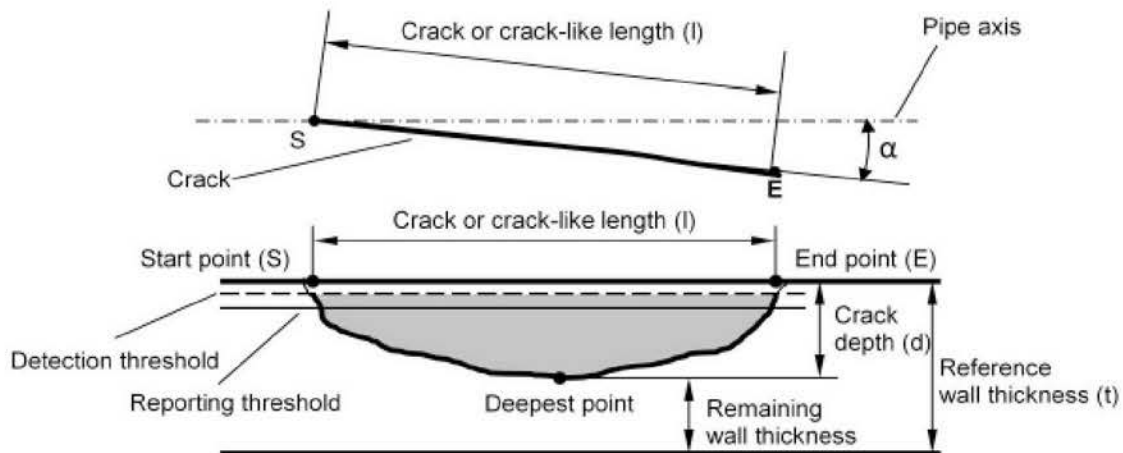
Illustration (top view and cross section) of parameters describing location and dimension of crack and crack-like features.
